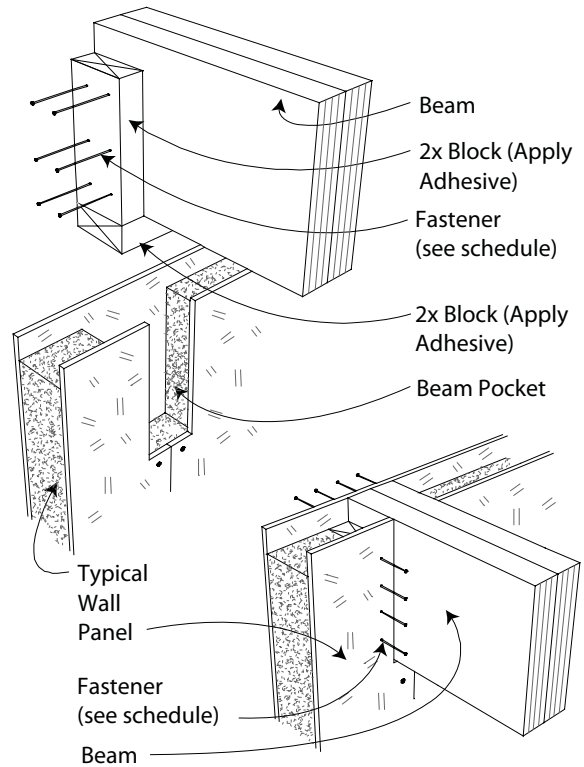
Beam Schematic. Load carrying beams may be called for in different locations, depending on the structural requirements of the house. Beams are set into beam pockets in the wall panels, which distribute the load into the wall panels.
